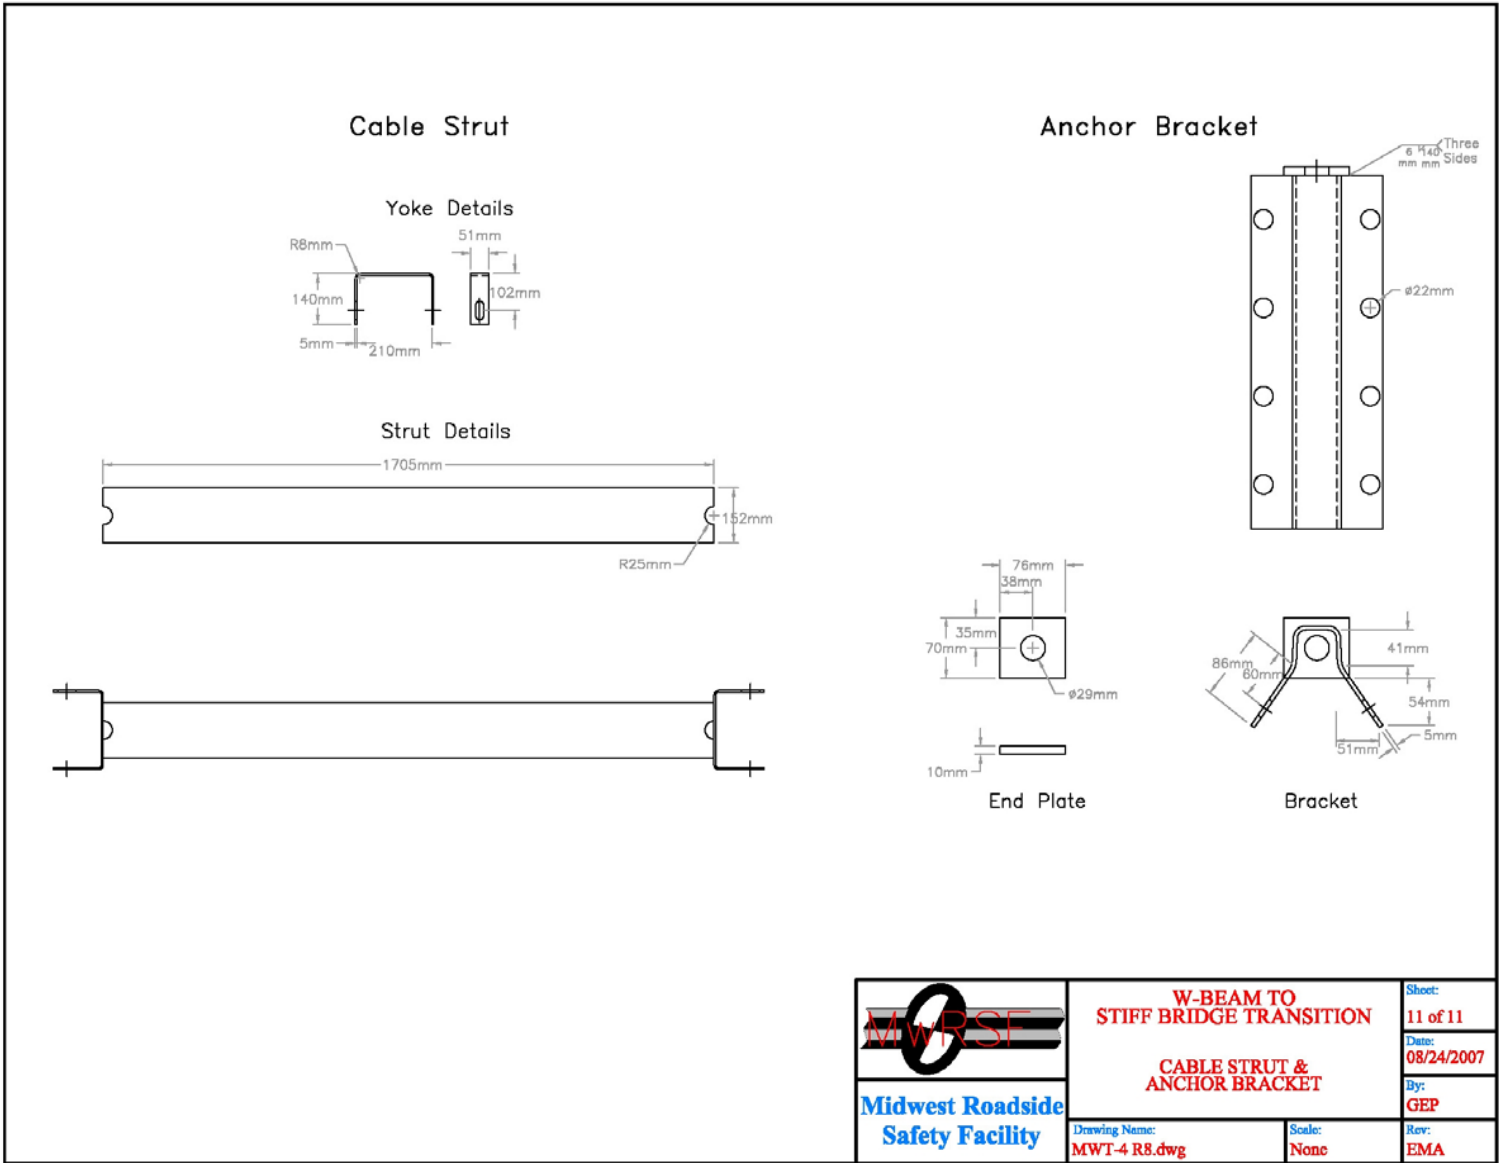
Cable Strut and Anchor Bracket Details (Design No. 2)
